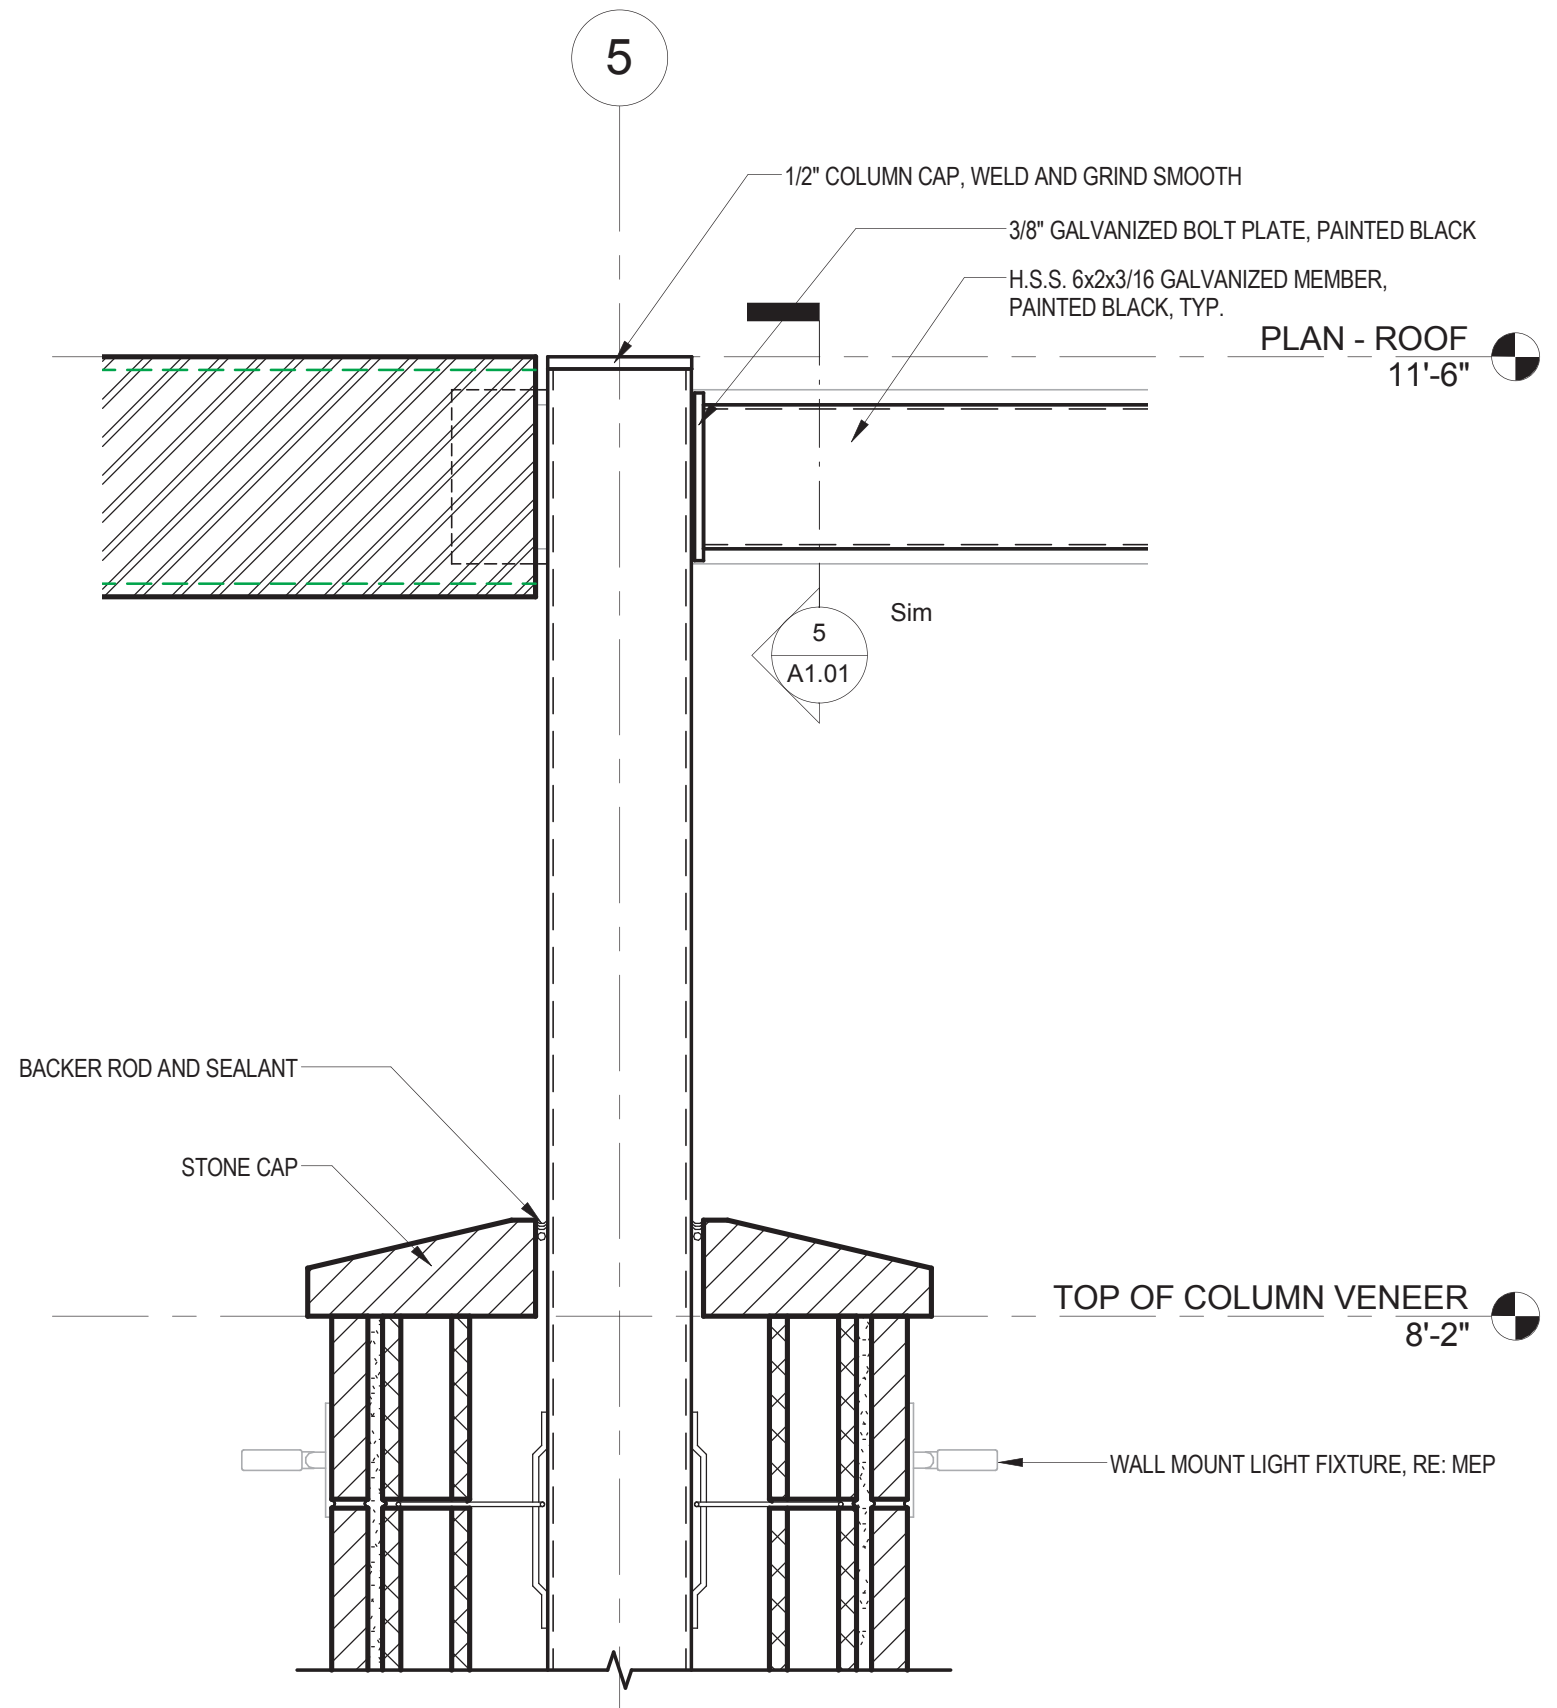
DETAIL - TYP. LLOUVER PLATE 1 1/2" = 1'-0" 7
